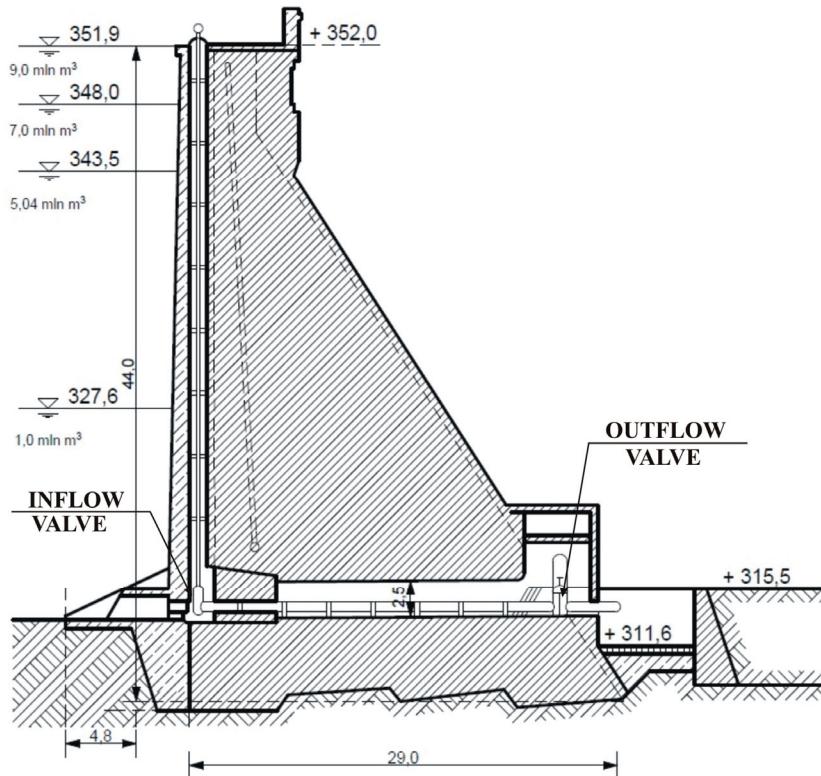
Cross-section of the Lubachów storage reservoir bottom outlet
